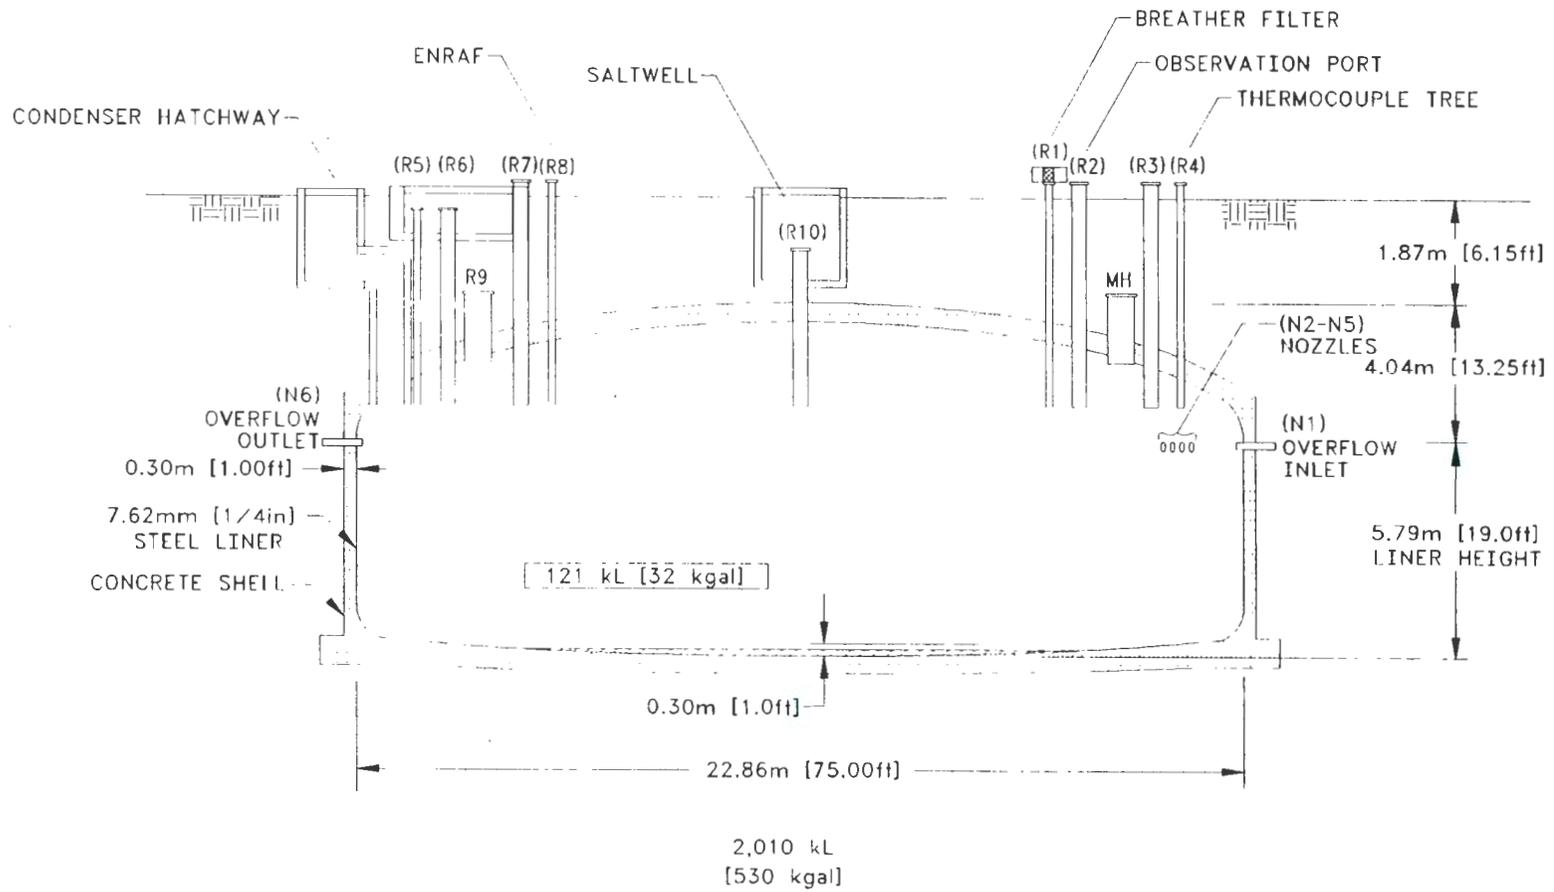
Tank 241-T-102 Cross Section and Schematic.
